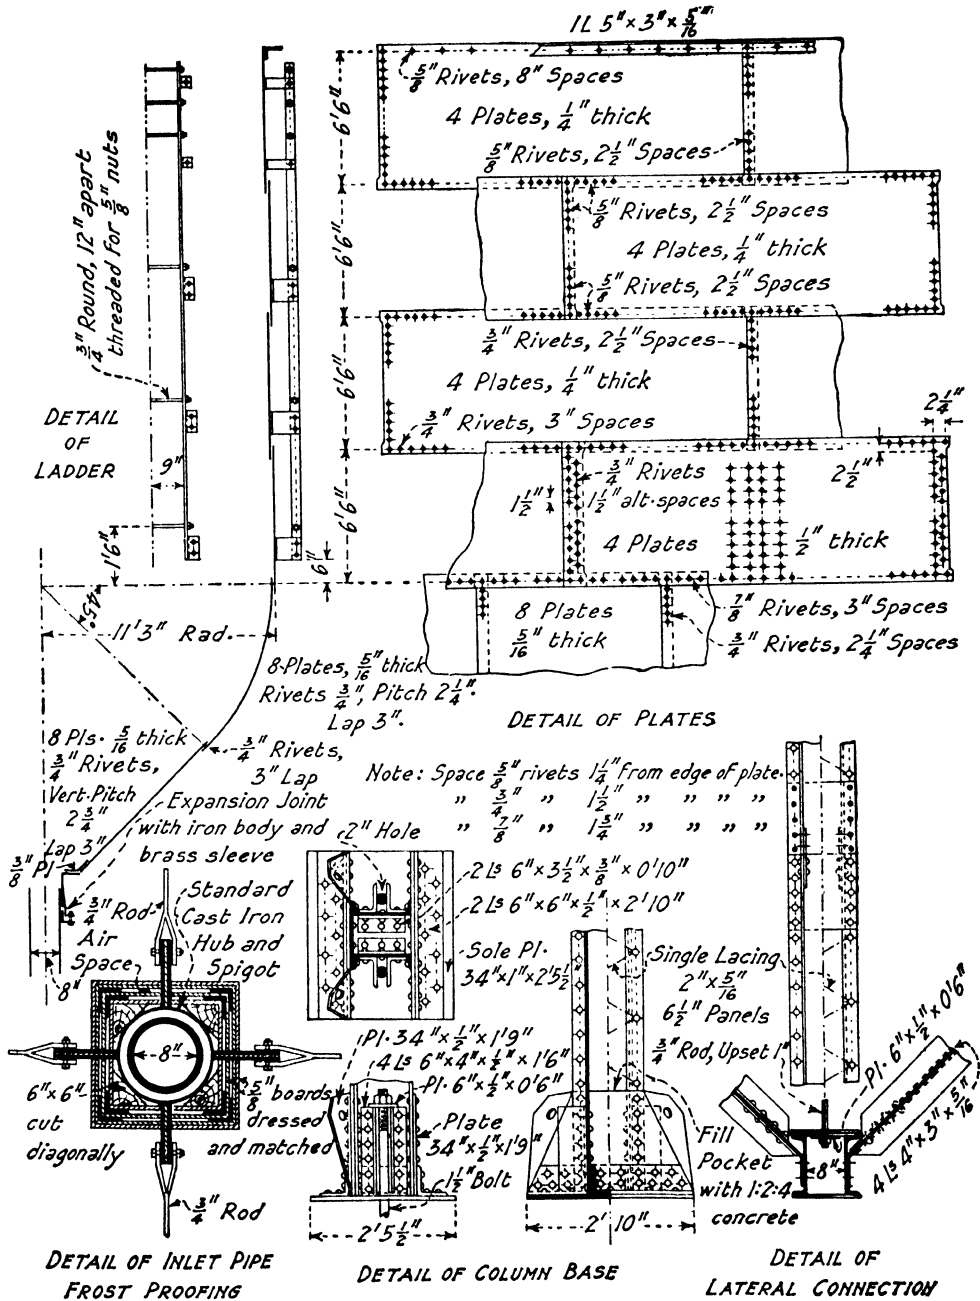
ELEVATED TANK AND TOWER, JACKSON, MINN.
